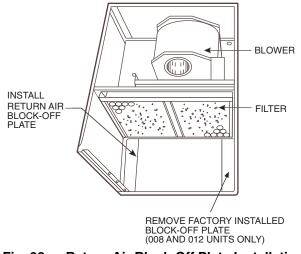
Return Air Block-Off Plate Installation (48TF014 Units Only)
